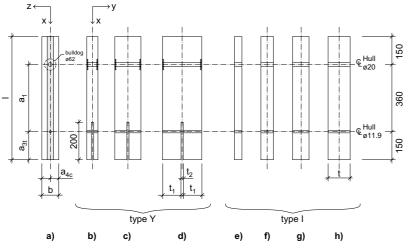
Test specimen geometry for tests with single dowels (hull = hole)
